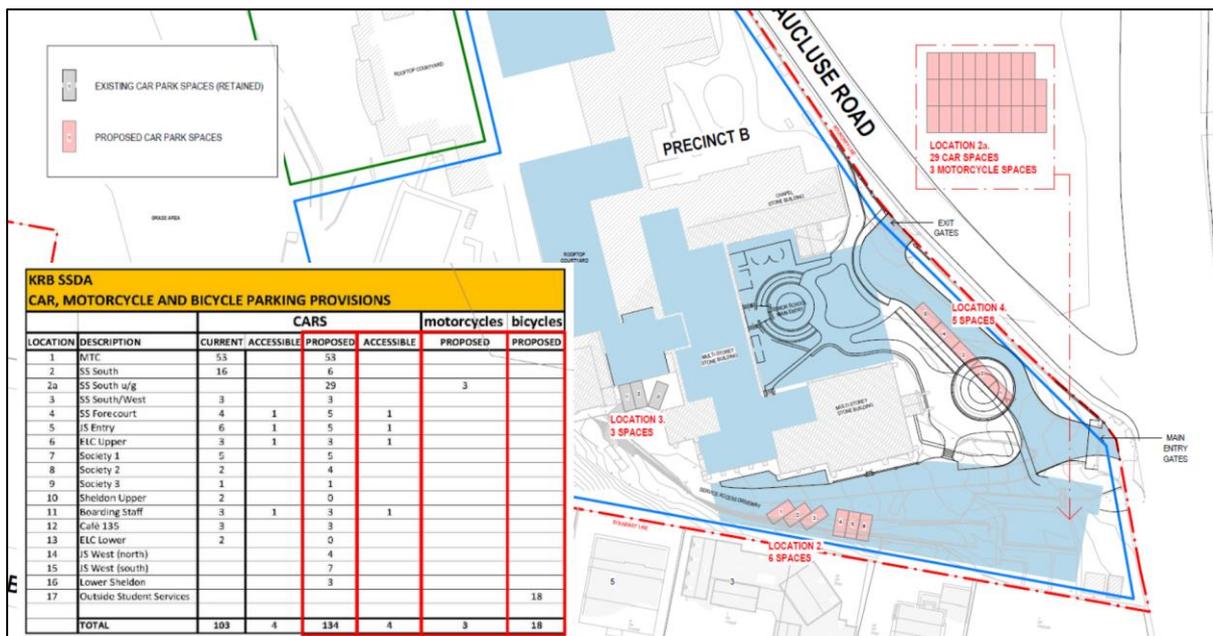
| Existing and proposed car parking precinct B (Source: Applicant's RtS)
